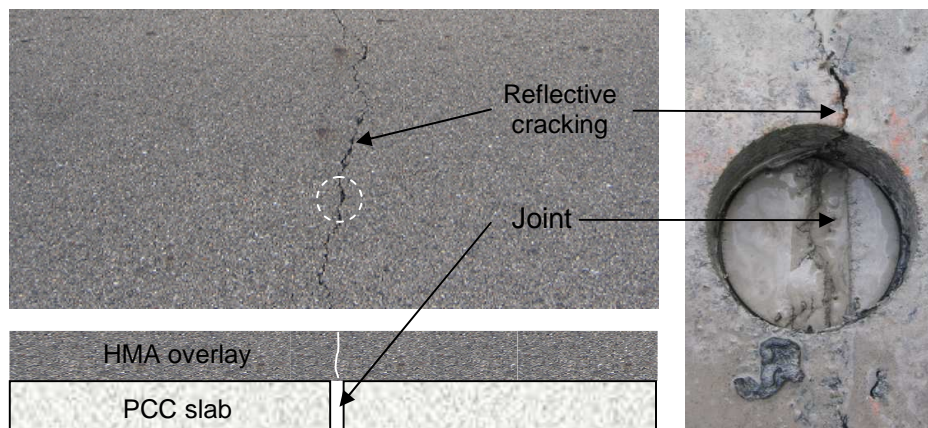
Typical transverse reflective cracking in an HMA overlay over jointed concrete pavement.
